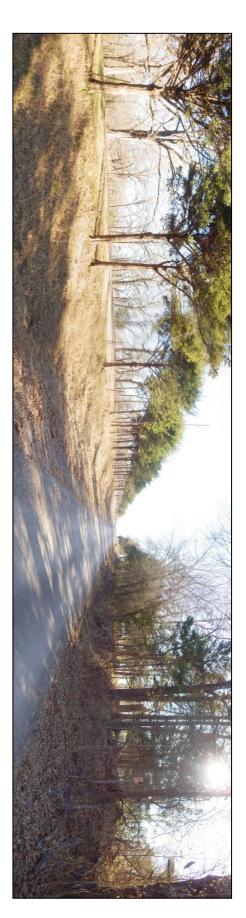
Top: View from west end of Proposed Bridge 3, facing west.
